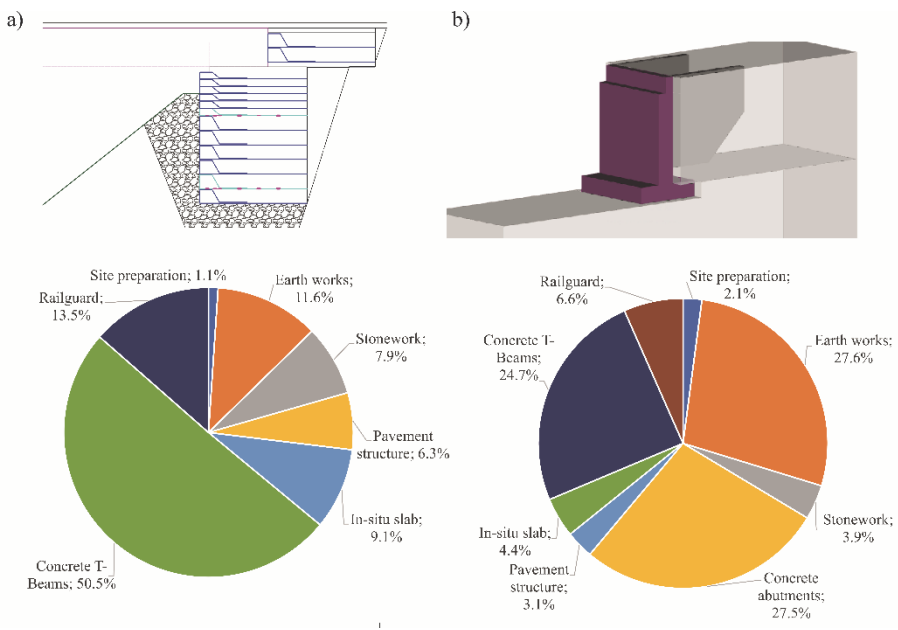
Construction cost breakdown: a) GRS-BA and b) reinforced concrete abutment.
